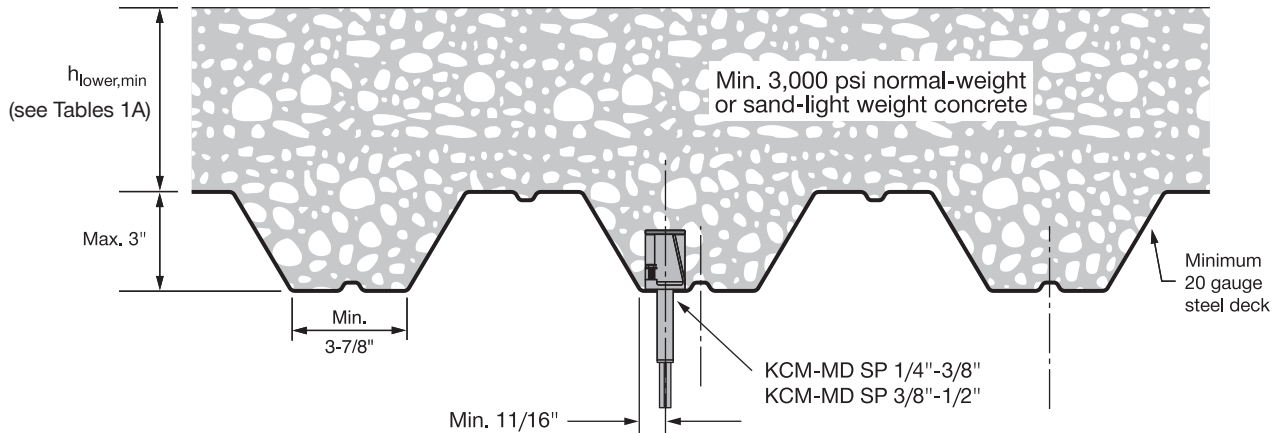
B —Installation in the soffits of concrete filled metal deck floor and roof assemblies-over upper flute (W-deck)
